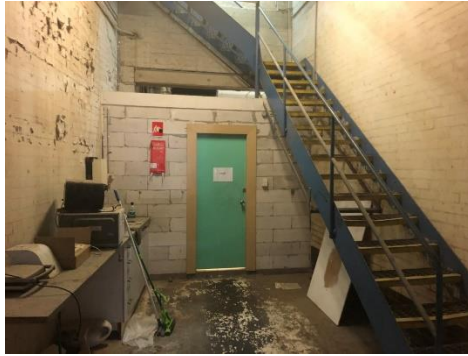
Stairwell and blockwork addition at the rear of Character Building 2. The brick wall on the left of this photograph is the boundary wall to Cecily Street
